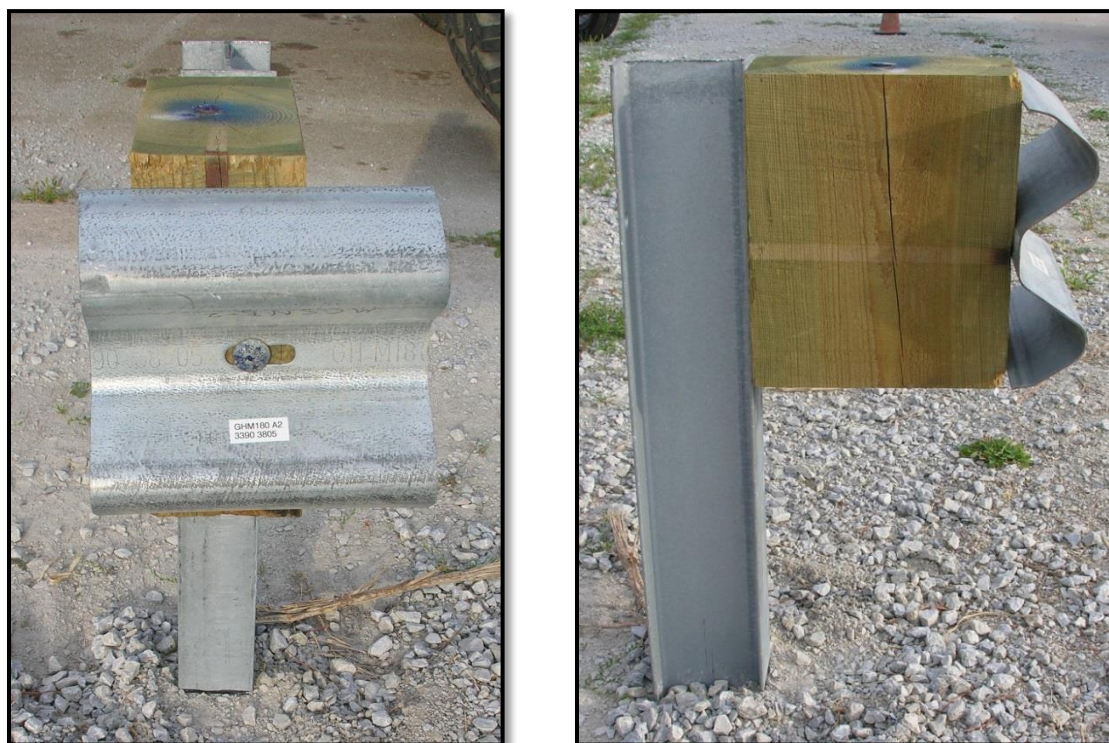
Test Setup to Measure Guardrail Bolt Torque
